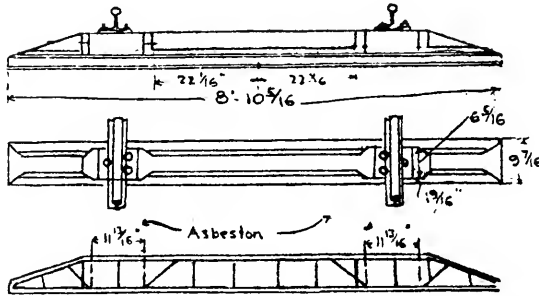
"ASBESTON" REINFORCED CONCRETE TIE (RUD. WOLLE, LEIPZIG, GERMANY).
